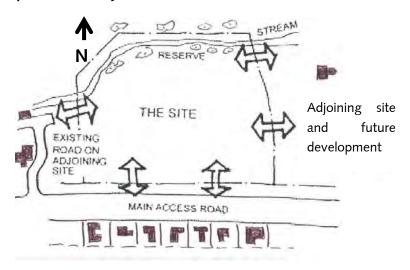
Layout planning reflecting connectivity and permeability developed from site analysis
